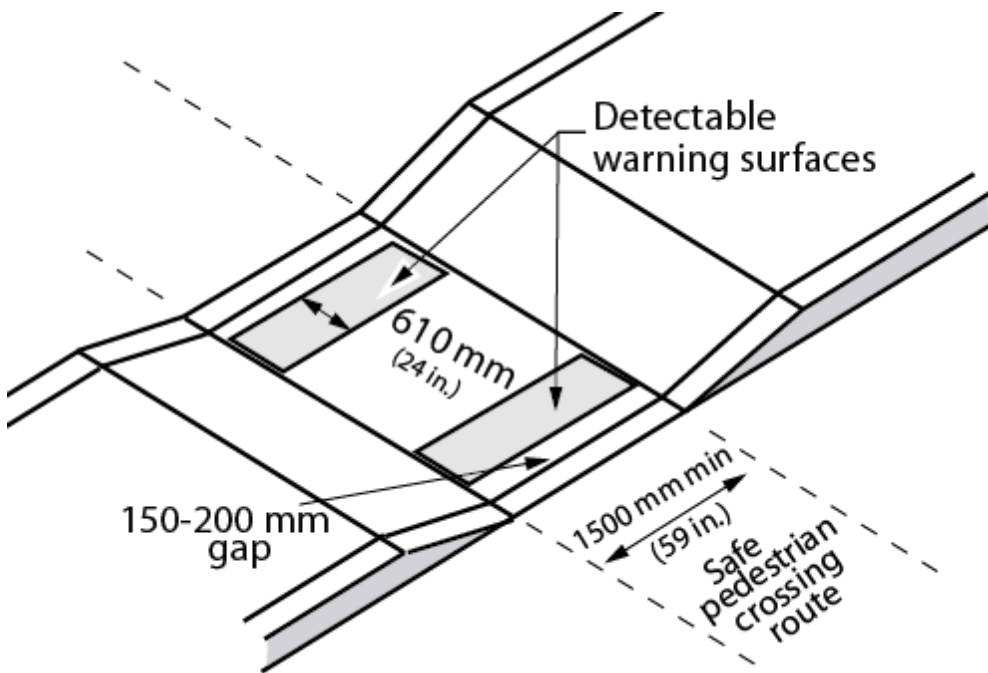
Curb Ramp at Narrow Median Sidewalk Crossing
